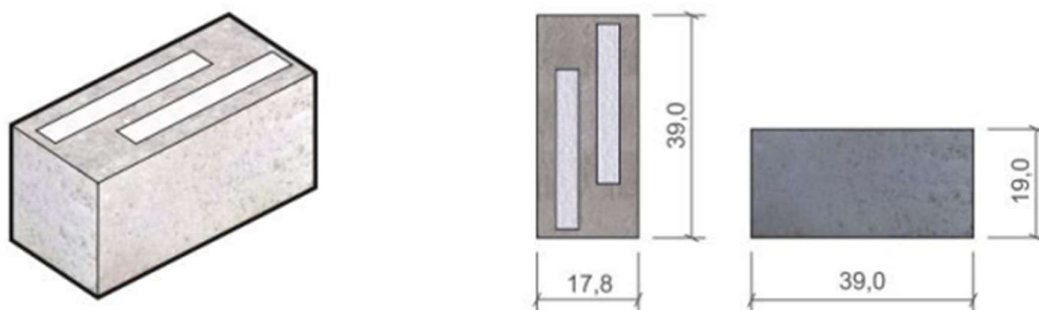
Schematic diagram of a thermal construction block TermoAmerWall 17,8.
